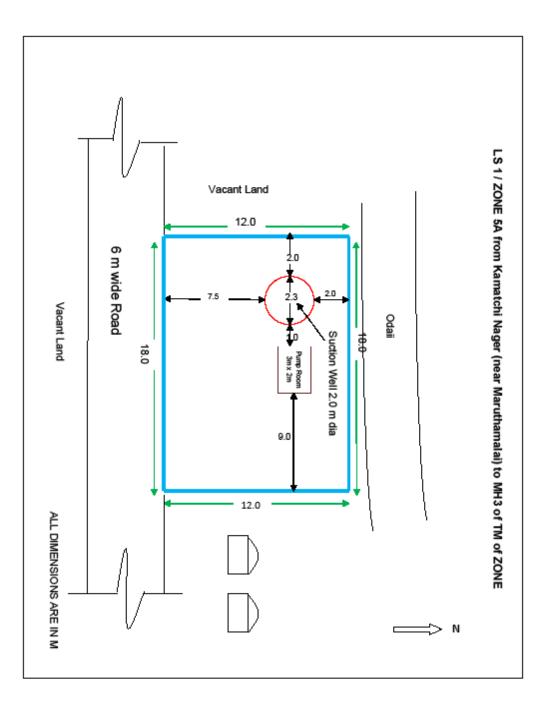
Site Set out Plans – Zone V (Vadavalli & Veerakeralam)
